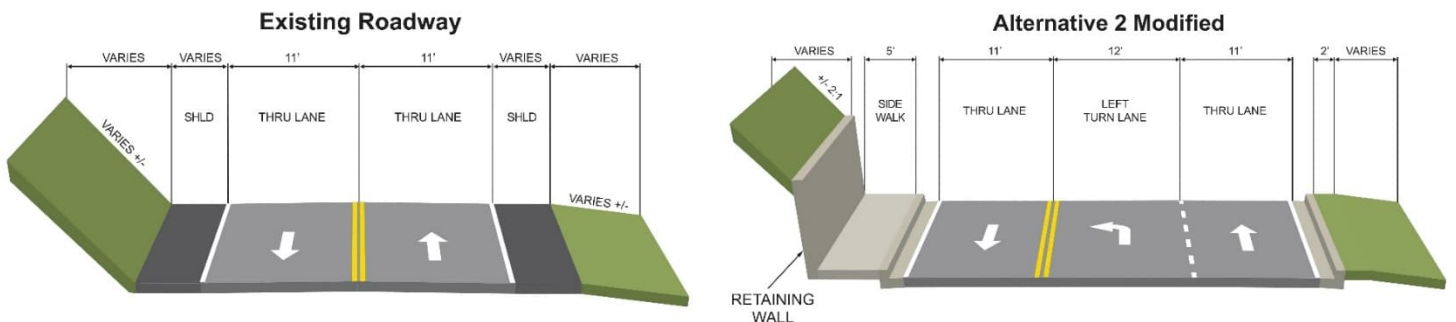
Typical Section of Existing Roadway and Planned Roadway Redesign, US 220 in Project Area
